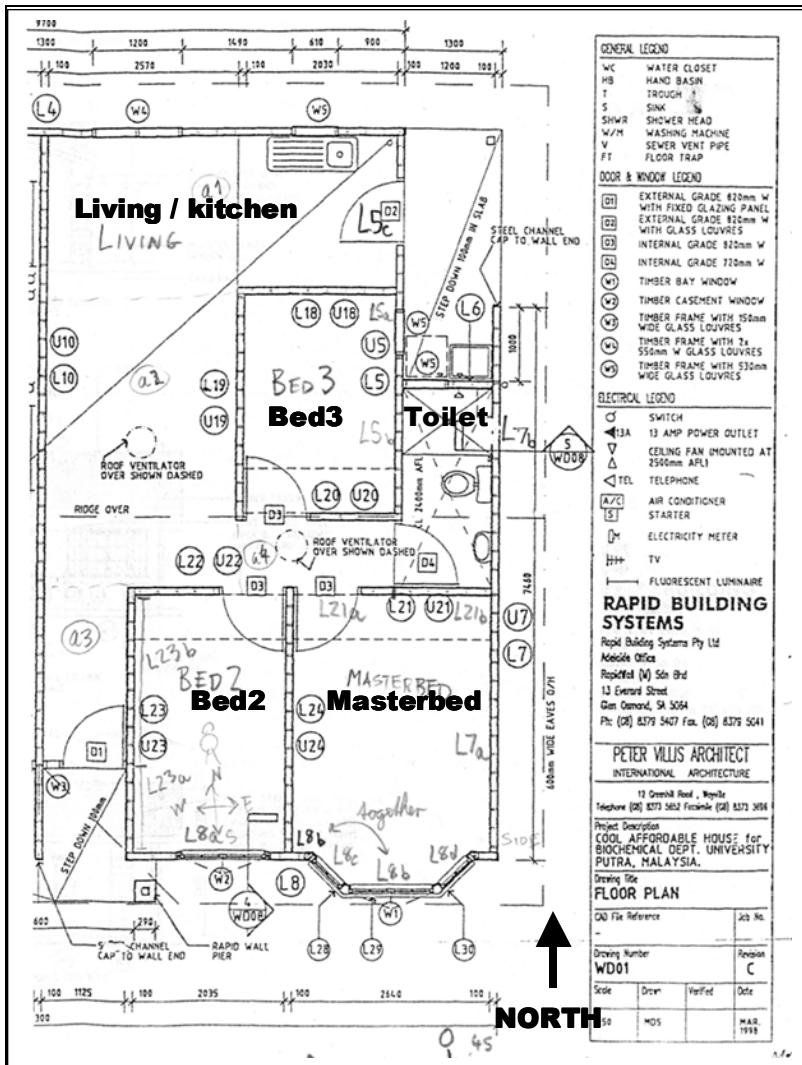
Floor plan of UPM Thermal Comfort House (60 m²). Reference will be made to the room names in later chapters.
